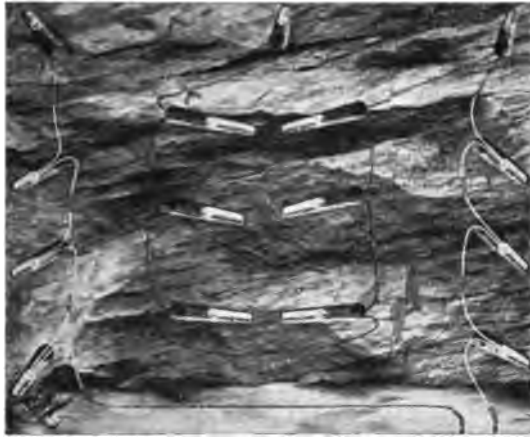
Method of Drilling and Loading Rock Tunnel Face.
